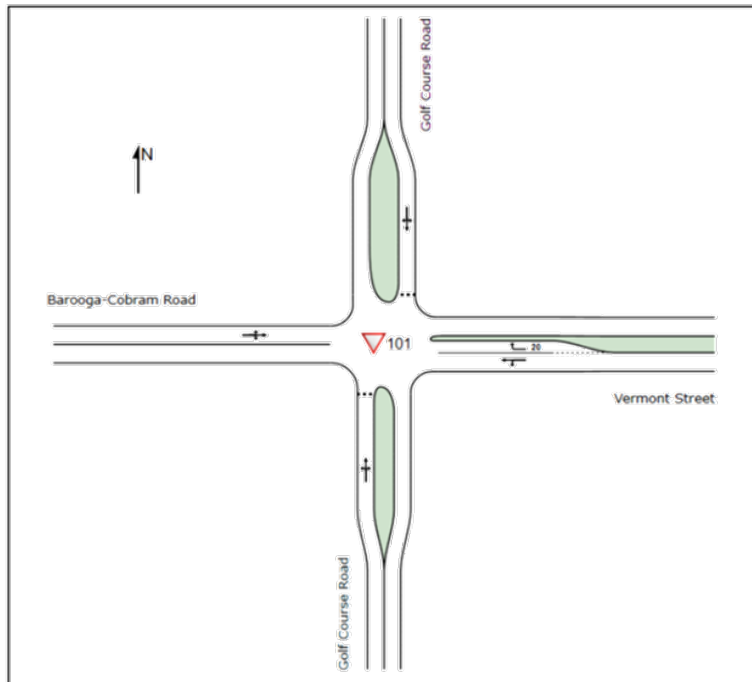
Barooga-Cobram Road / Vermont Street & Golf Course Road SIDRA intersection layout
